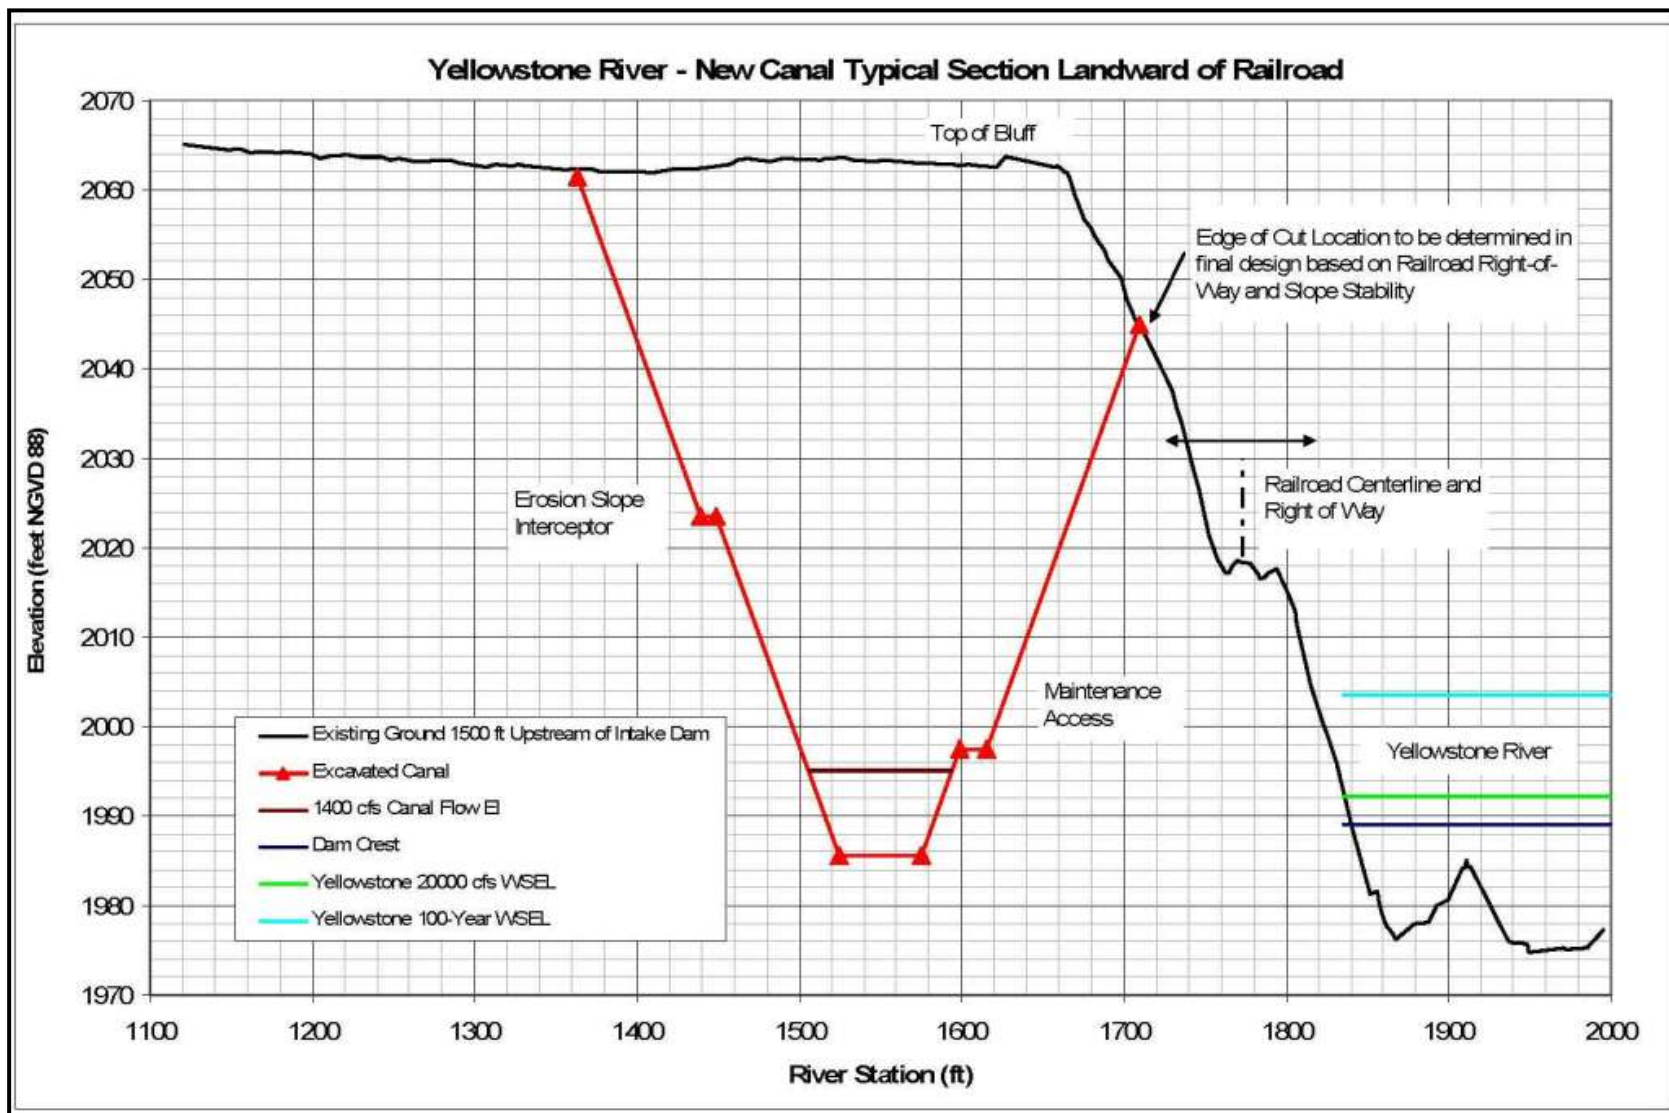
Relocate Diversion Upstream Canal – Typical Section.
